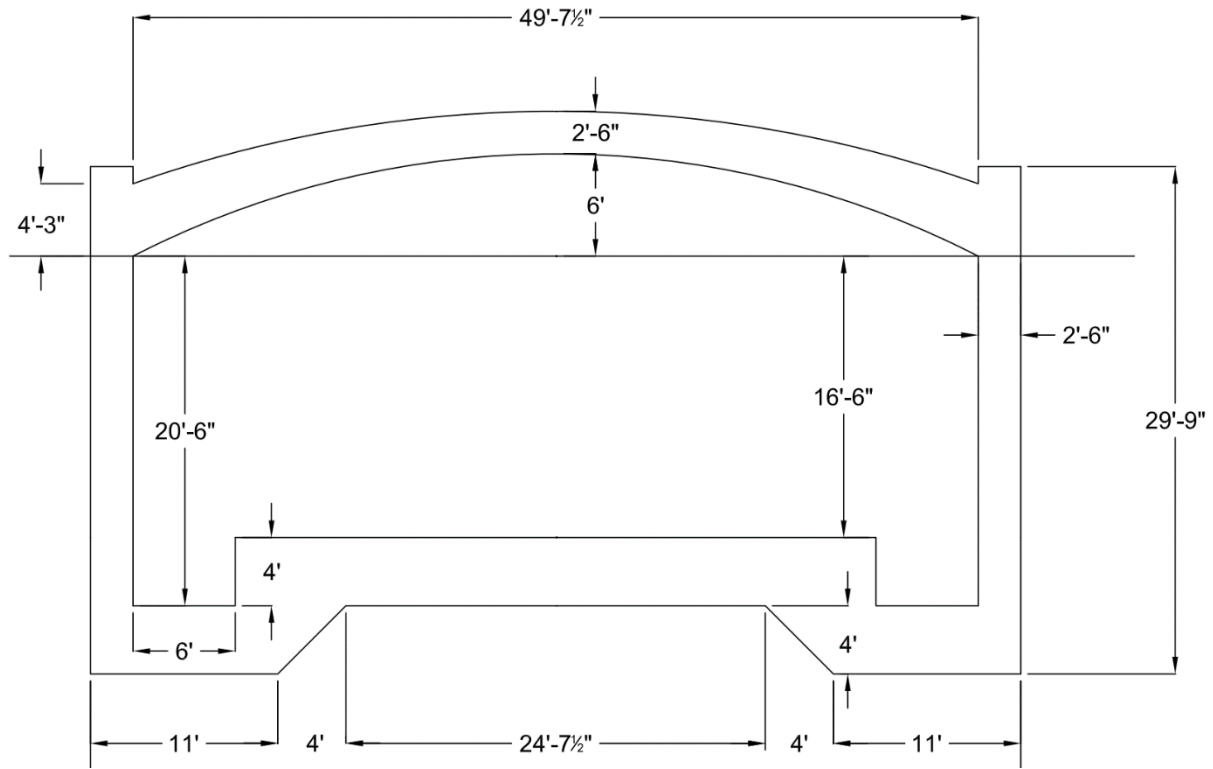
Equivalent unbanked full scale typical tunnel cross section
